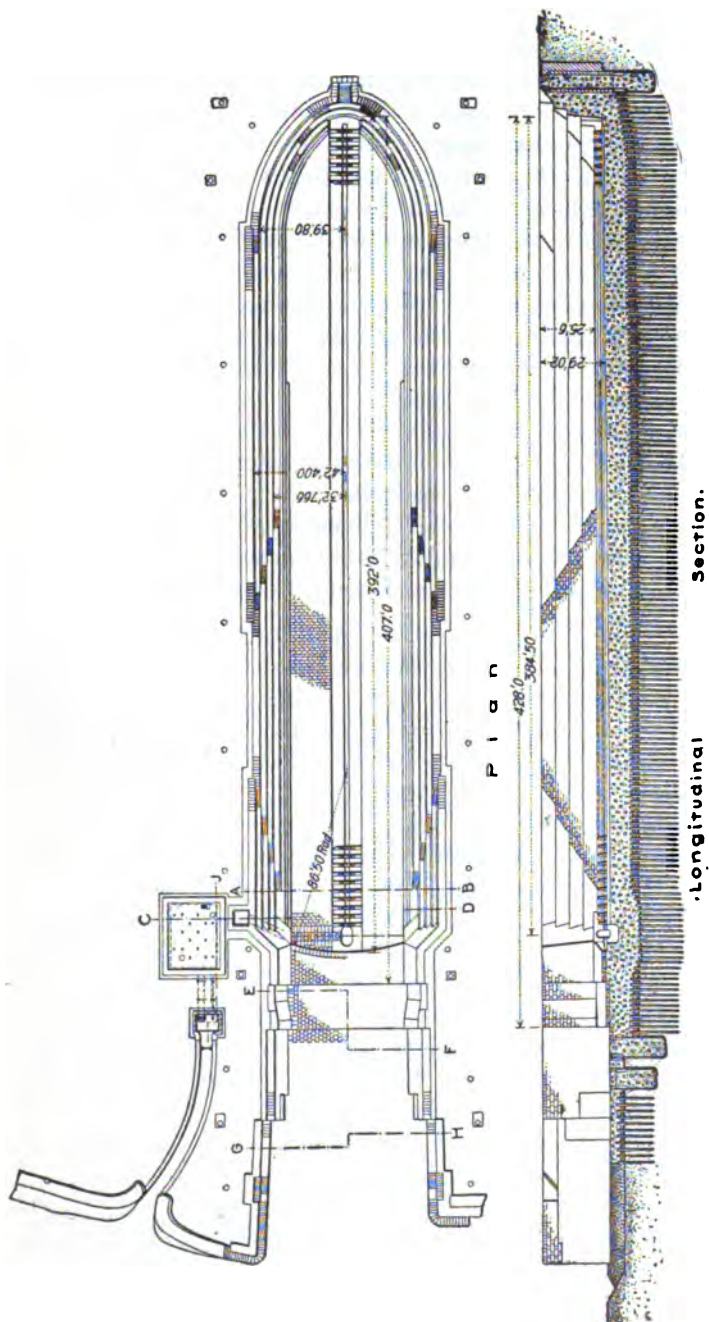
DRY DOCK AT KOBE, JAPAN.
